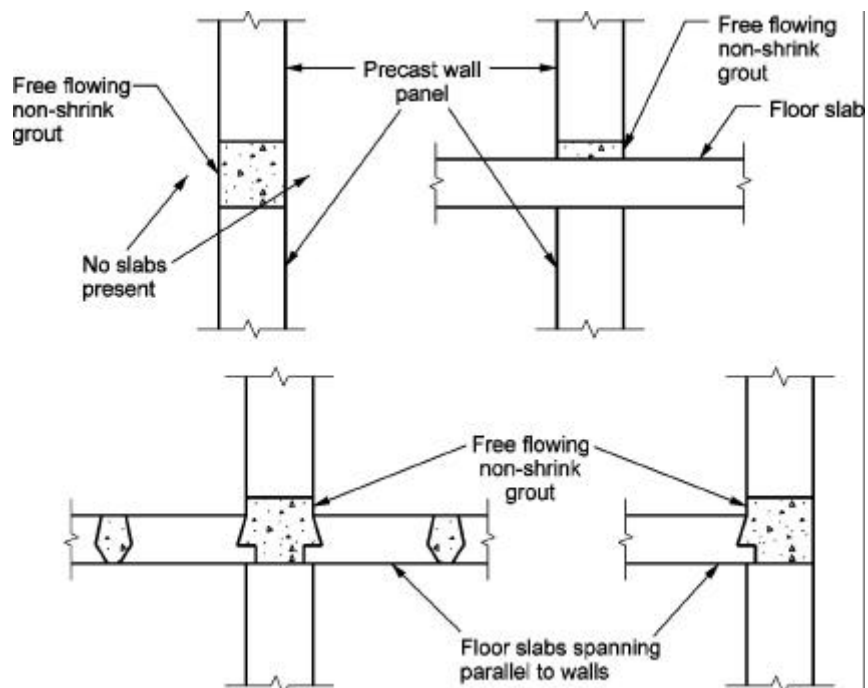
Horizontal wall joints not supporting floor slabs
